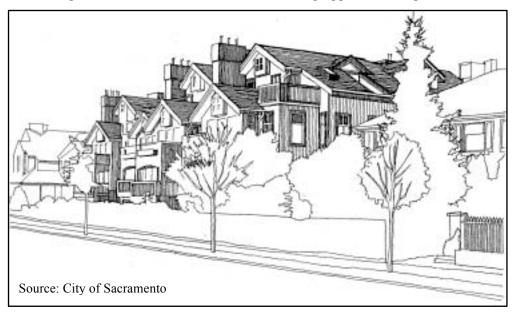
Architect's Illustration of Building Upper Level Step Down
